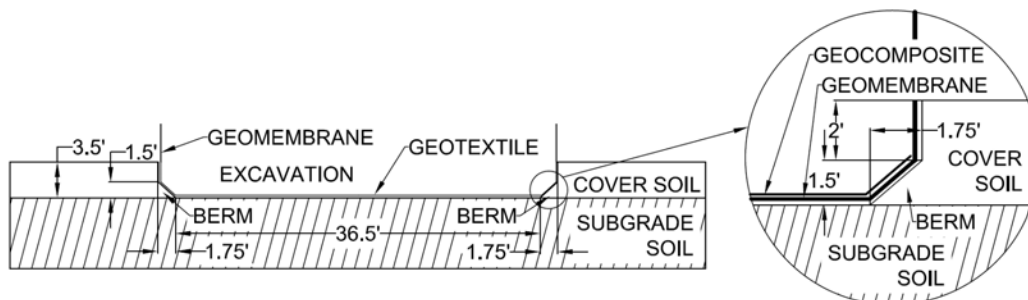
Schematic showing the excavation with geosynthetic placement.
